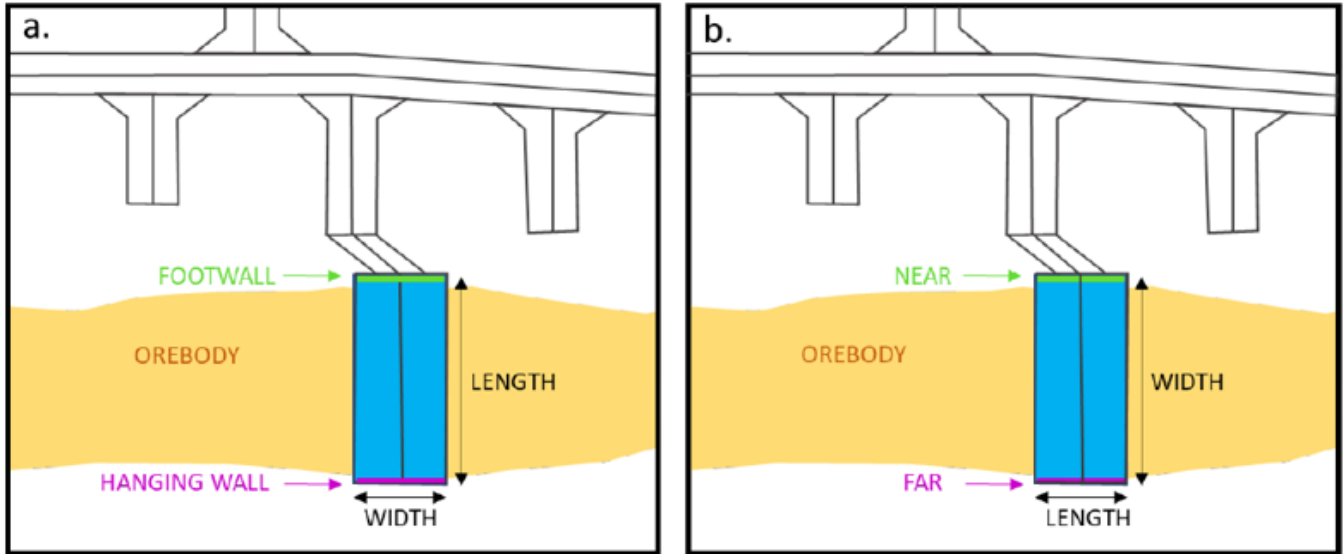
Dimensions for Transverse Sublevel Open Stopes (plan view)
